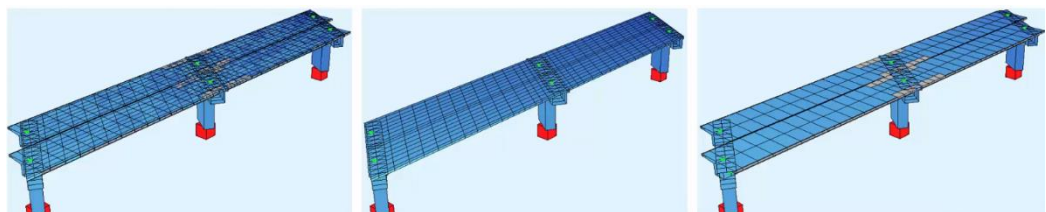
Orthotropic bridge deck (SOFiSTiK AG)
